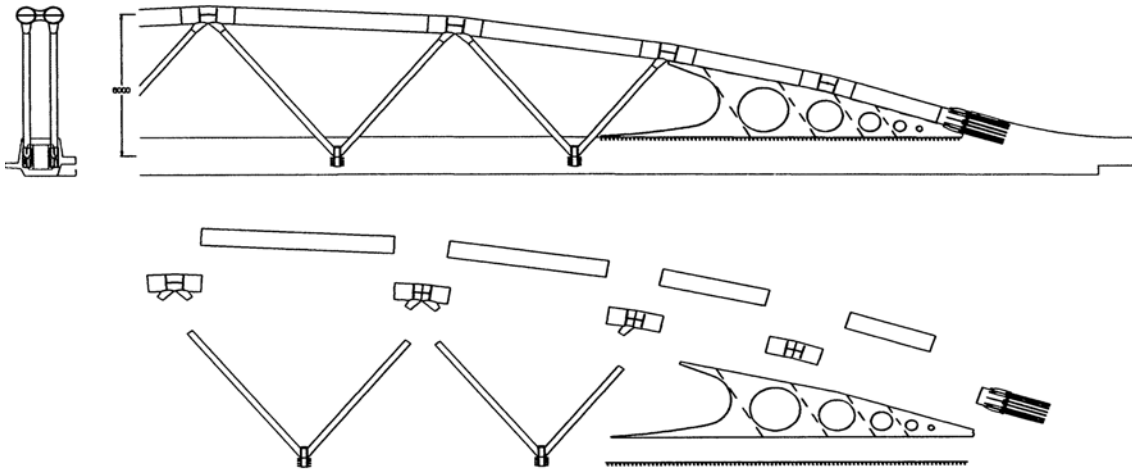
Arch structure: Main steel tubes, truss and distribution plate
